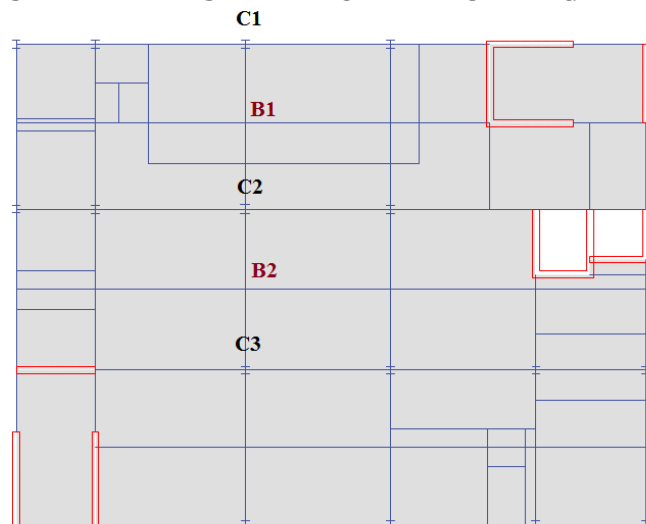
A Typical Structural Plan of the G+8 Building Showing Various Beams, Columns and Shear Walls in ETABS
